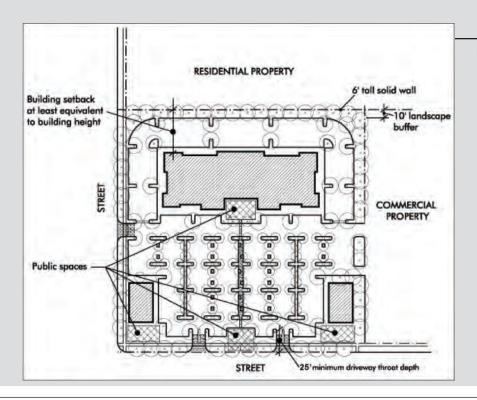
Parking, Circulation, and Buffering for Big Box Retail
